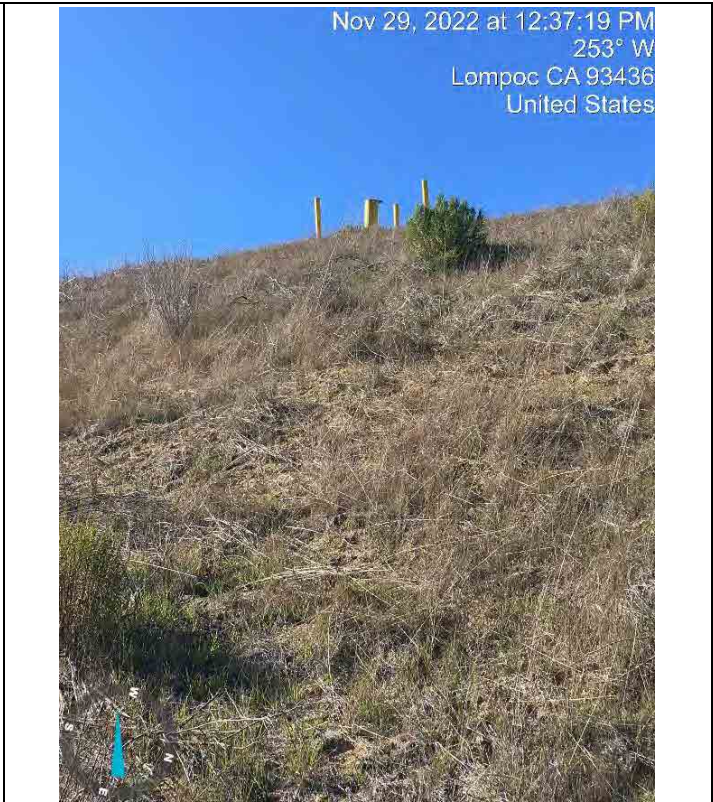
Western slope leading up to WD-MW-04 well vegetated (facing west-southwest)
